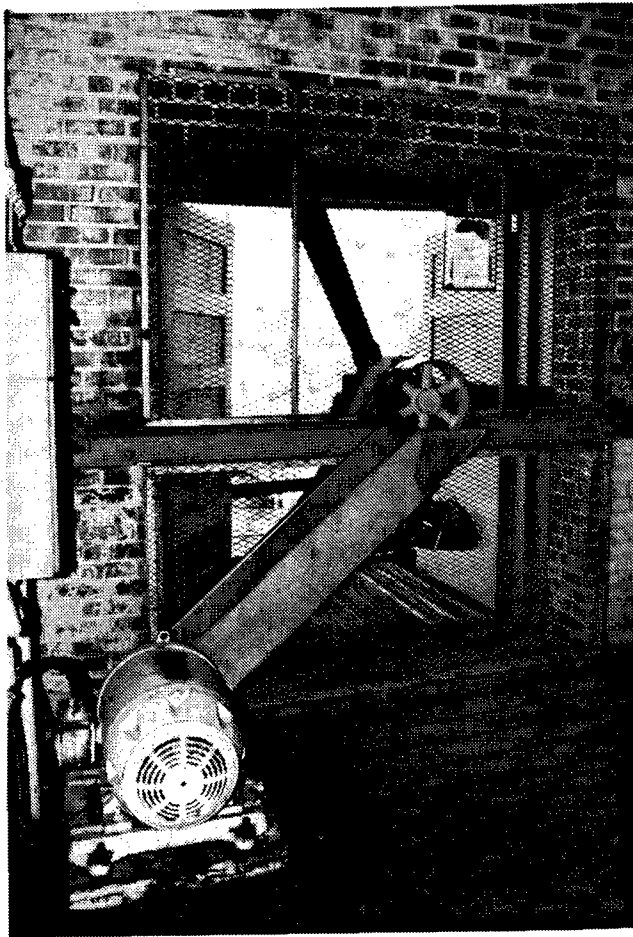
Building 1012: Interior view of the third floor showing a wooden propeller fan with its motor.
